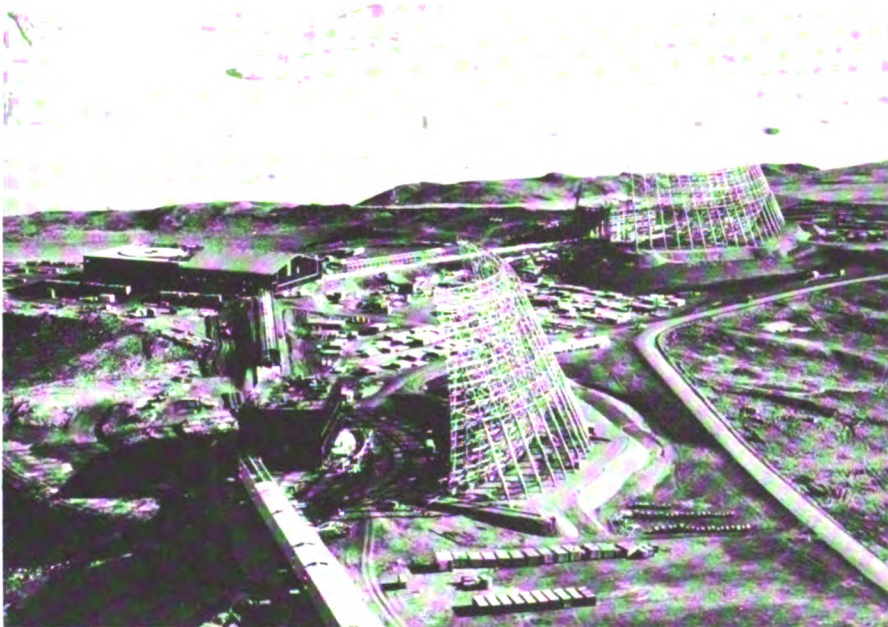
A view of the 400 ft. by 160 ft. antennas under construction at an Air Force BMEWS installation.
